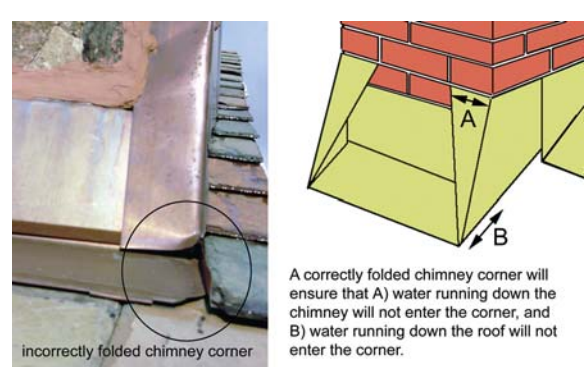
(above): This chimney corner flashing (left), although folded, was installed incorrectly and will surely leak. A properly folded corner flashing must account for the water that runs down the chimney as well as the water that runs down the roof. In effect, the flashing should create a mini-roof over each corner.
